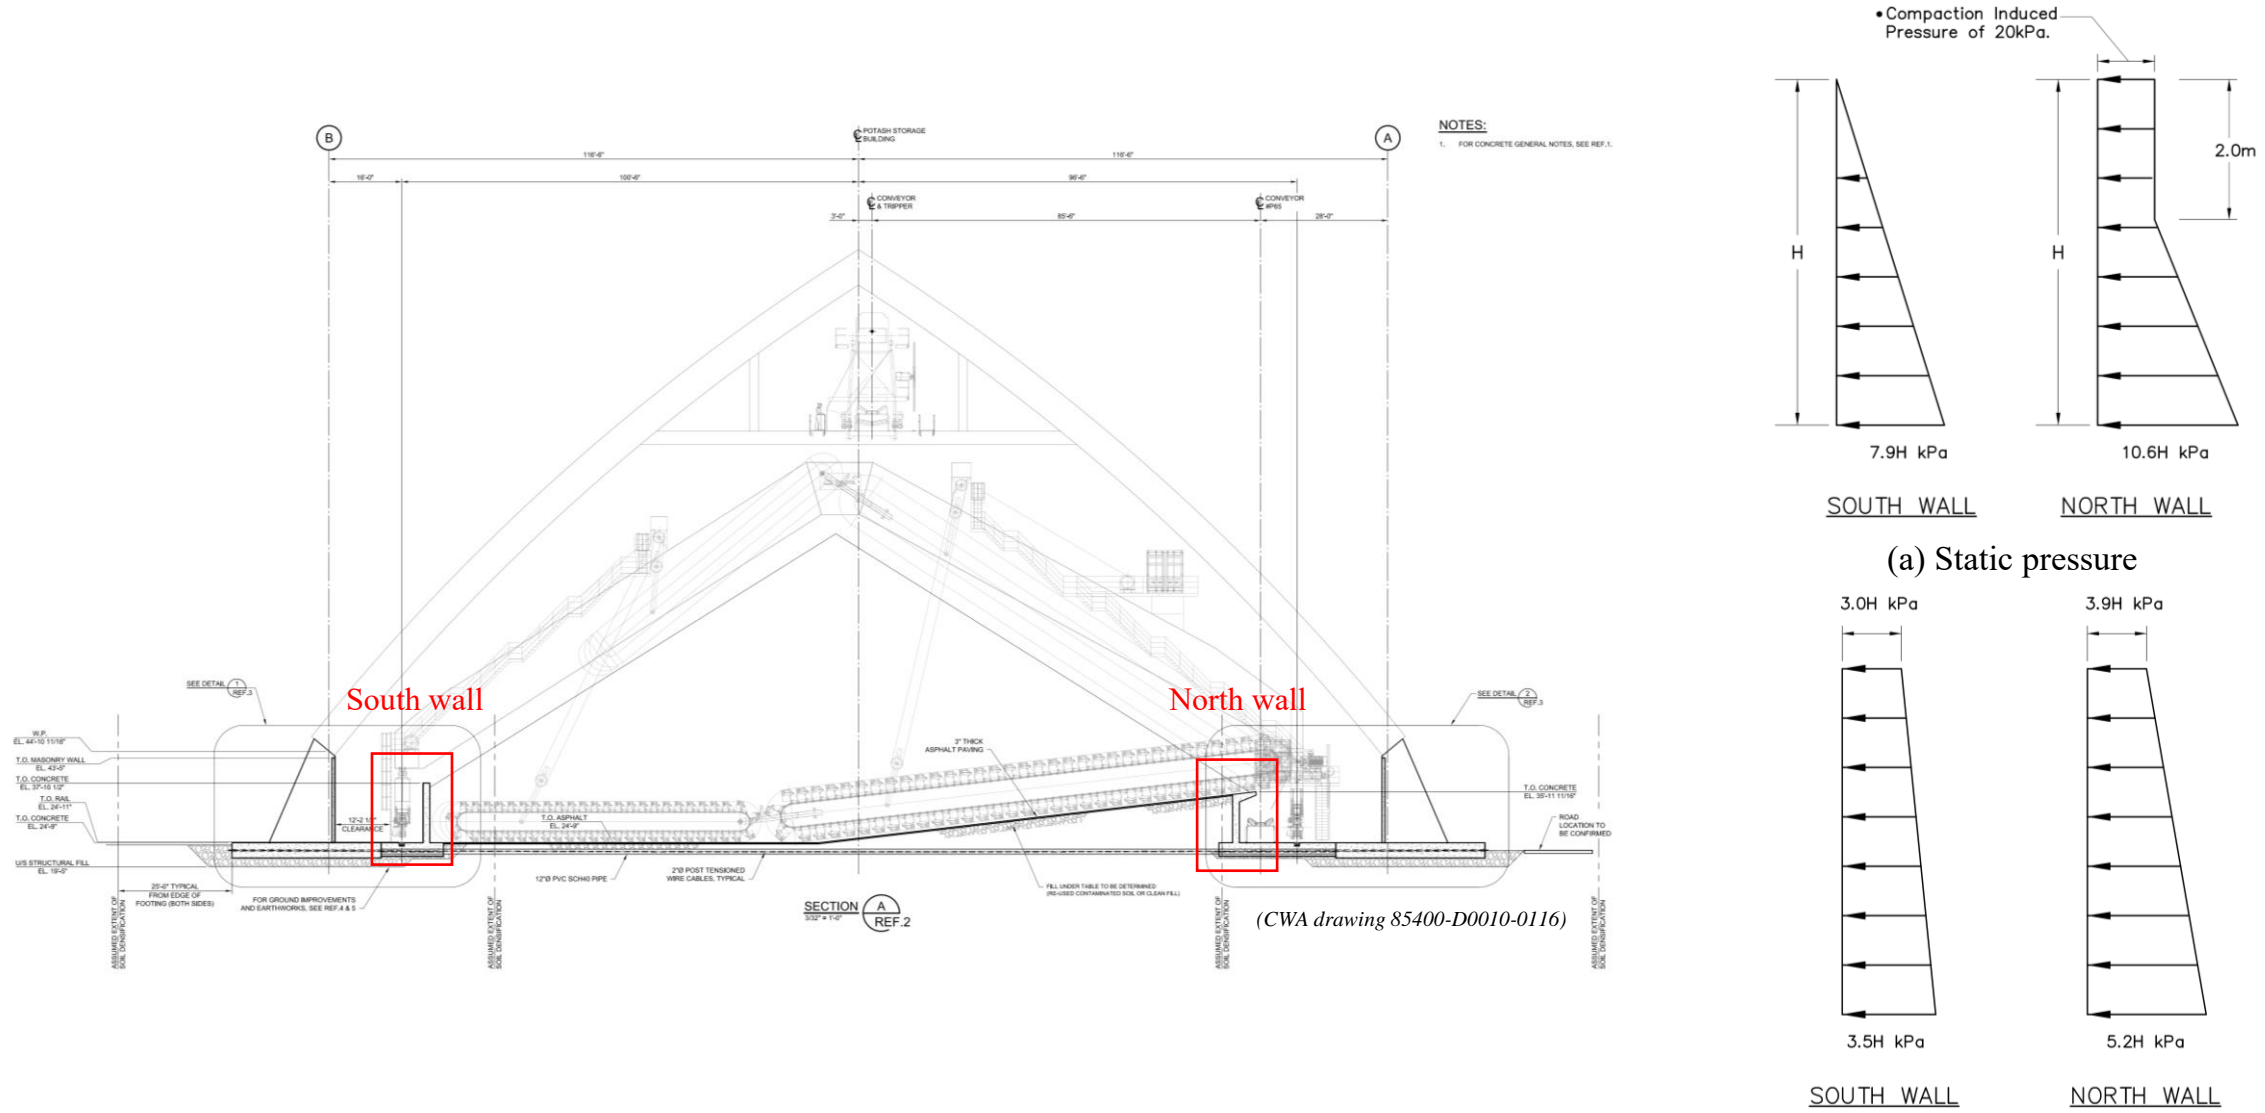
Horizontal wall pressure diagram for potash retaining walls
